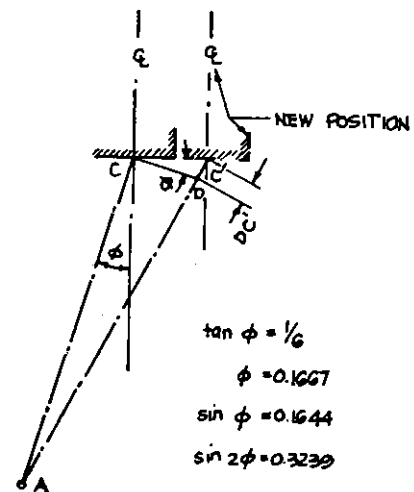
(b) Horizontal movement due to pile deformation (bridge Example 2)
